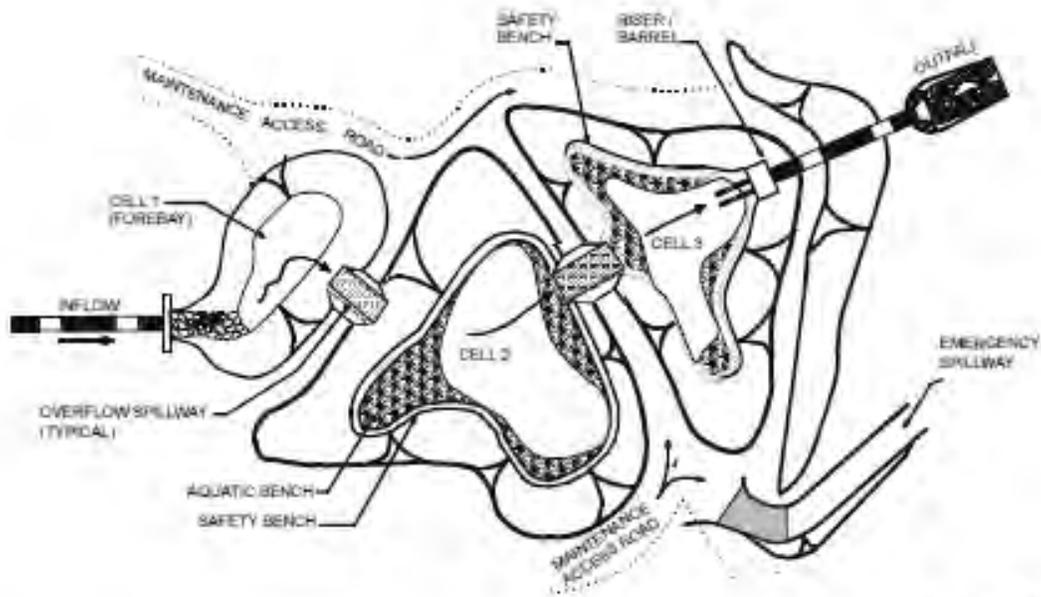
14 Plan View of Multiple Pond System.
